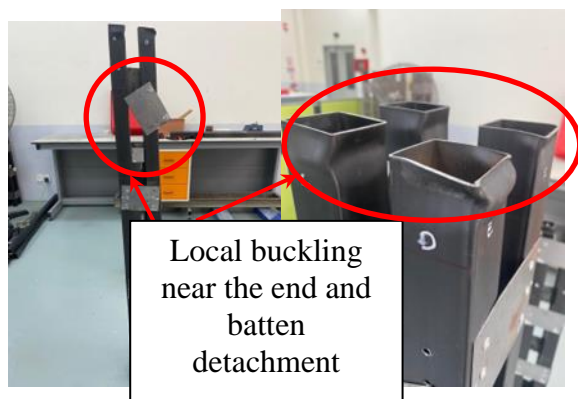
Failure modes for specimen CFS built-up batted column with SHS of S2-H2-B400
